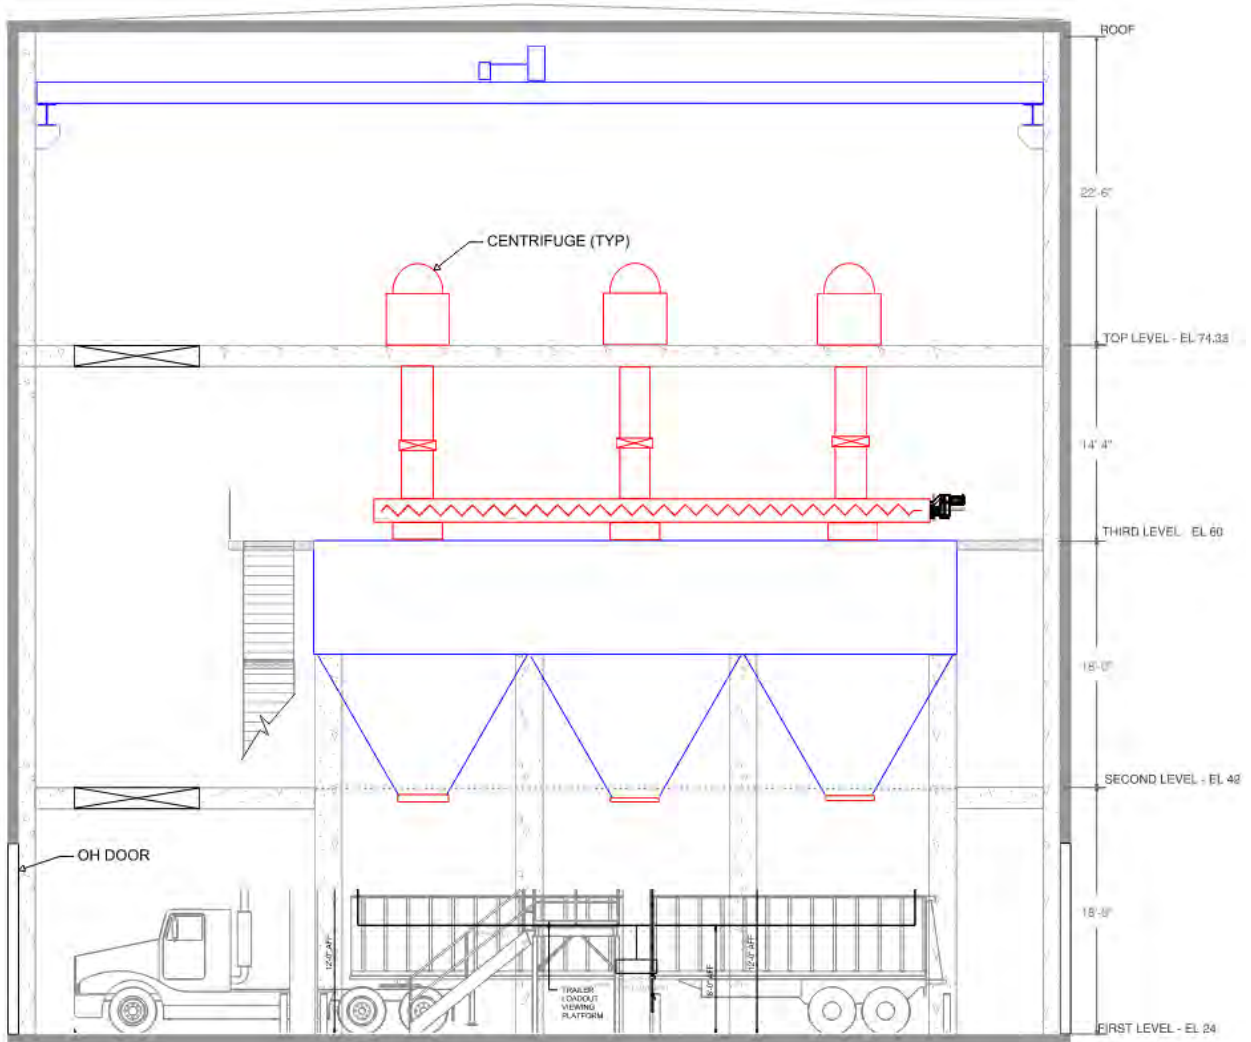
New Thickening/Screening/Pre-dewatering and Final Dewatering Facility Section 1
